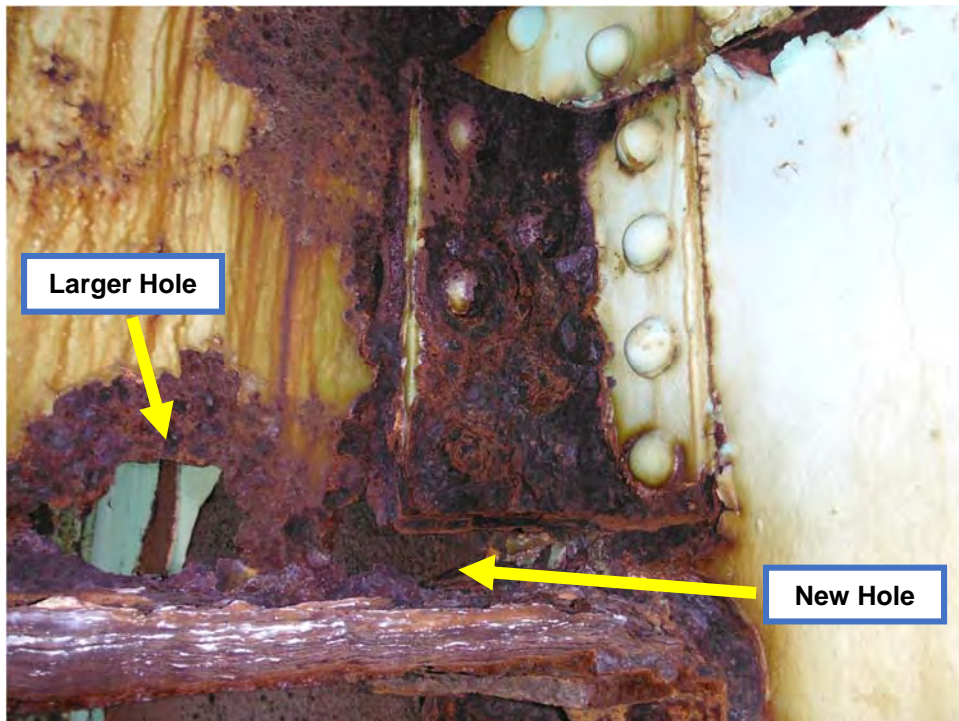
Span 1 and 2 Floor System - Typical Condition at Joint Locations
